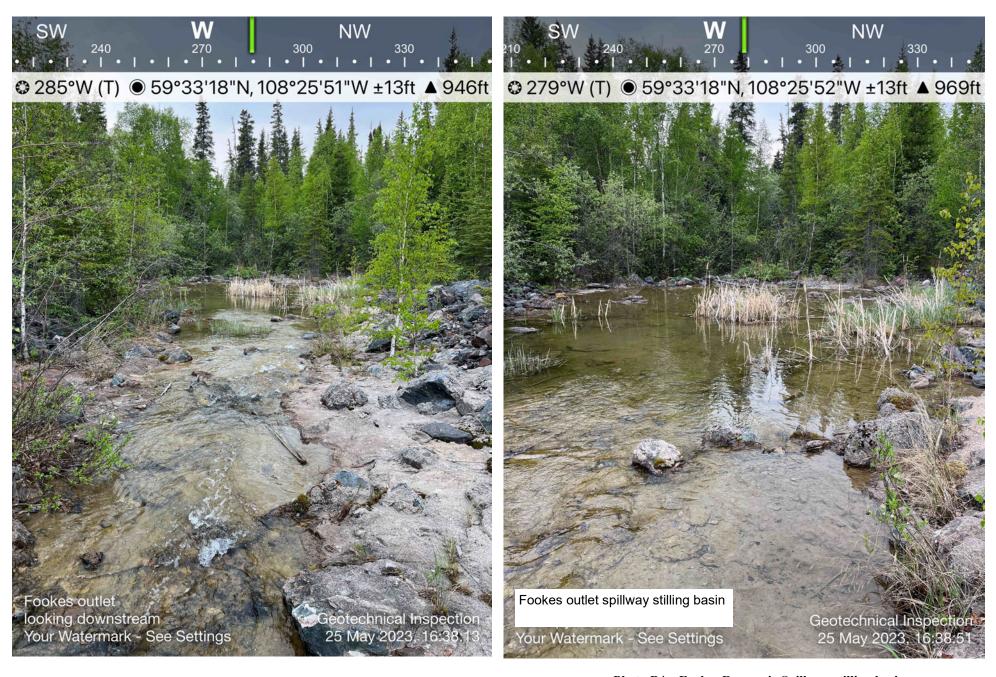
Fookes Reservoir Spillway looking downstream (mid channel)
